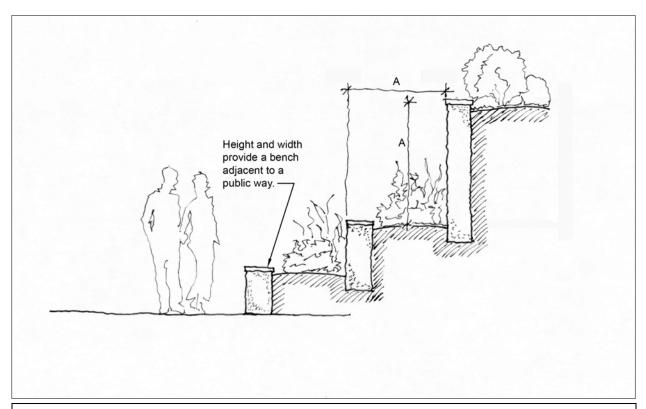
Example of retaining wall design. Dimension A (width of the bench) must be at least equal to the height of the retaining wall.
